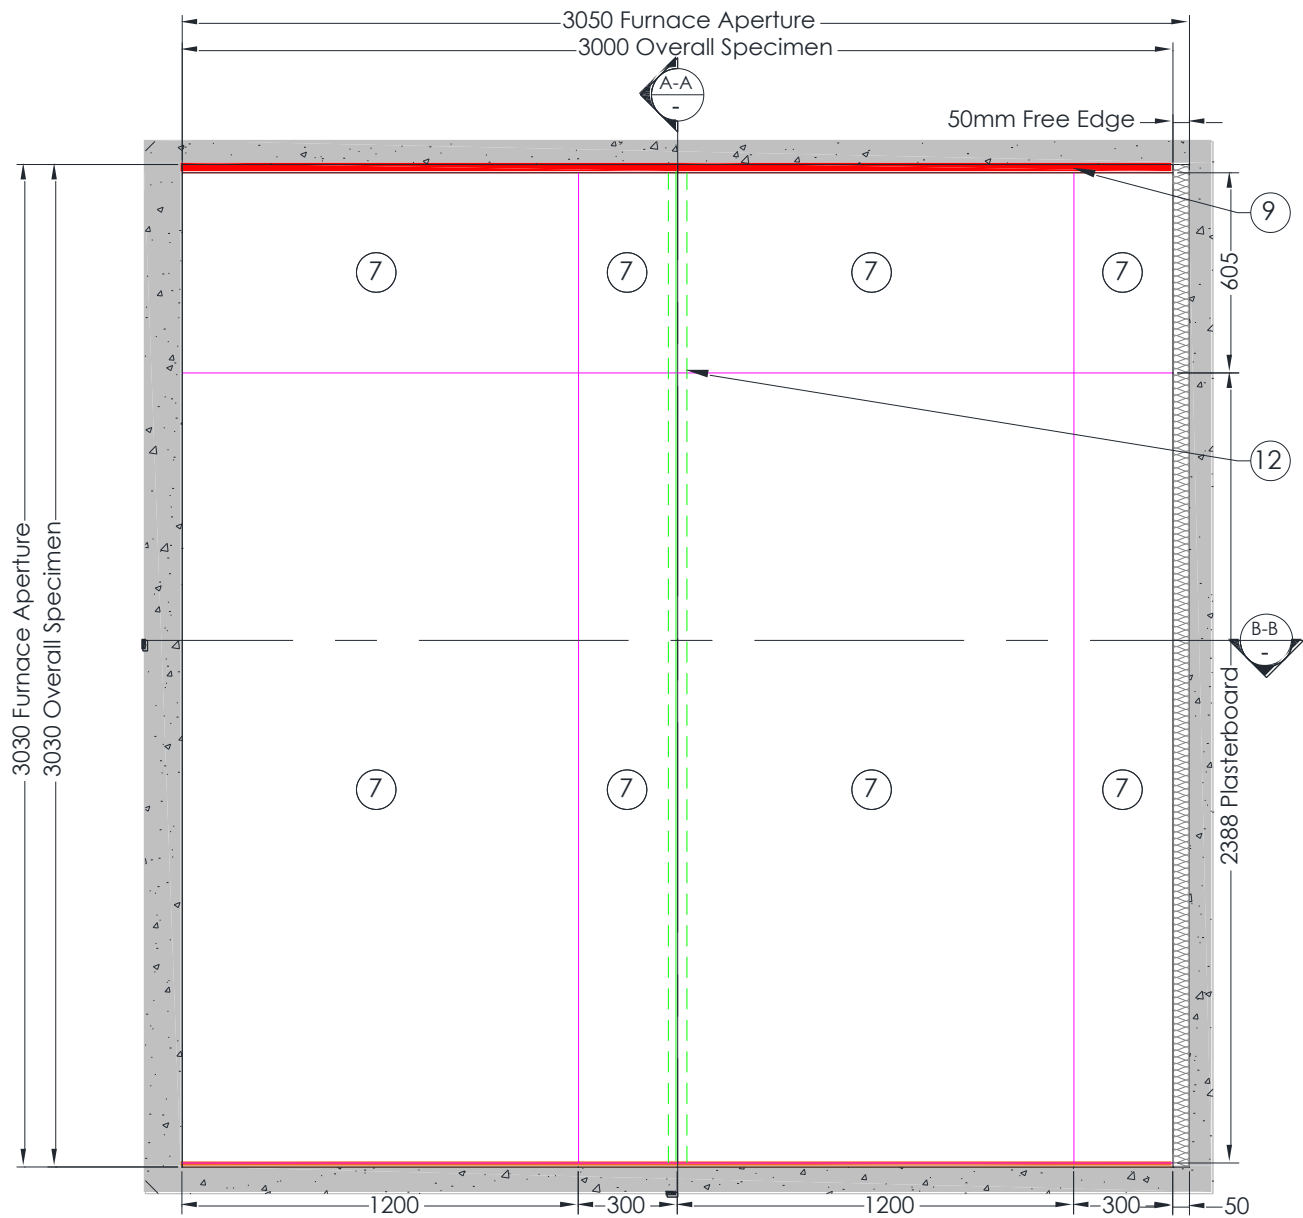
General Elevation of Test Specimen Showing Inner Plasterboard Layout – Exposed Face
